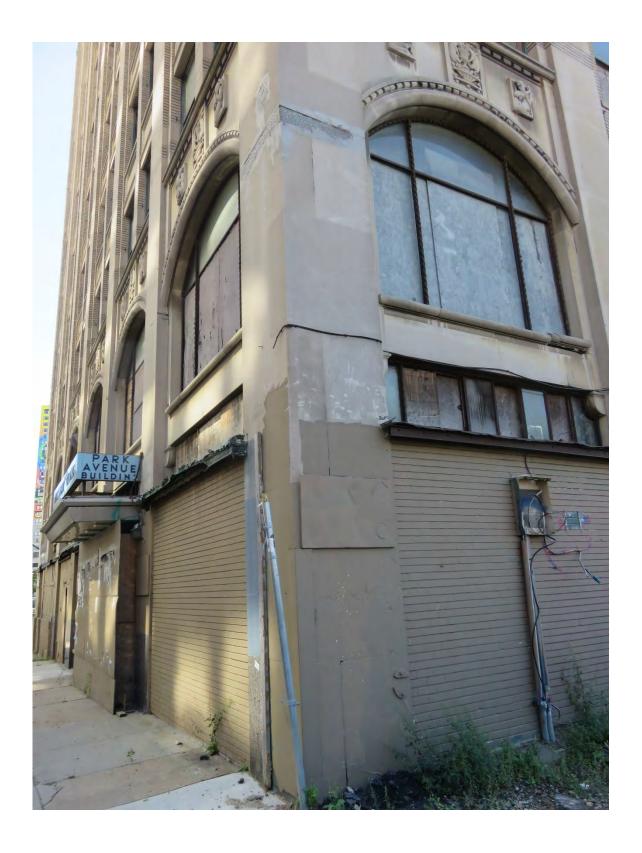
Exterior, window detail, looking southwest. 9/11/2018
